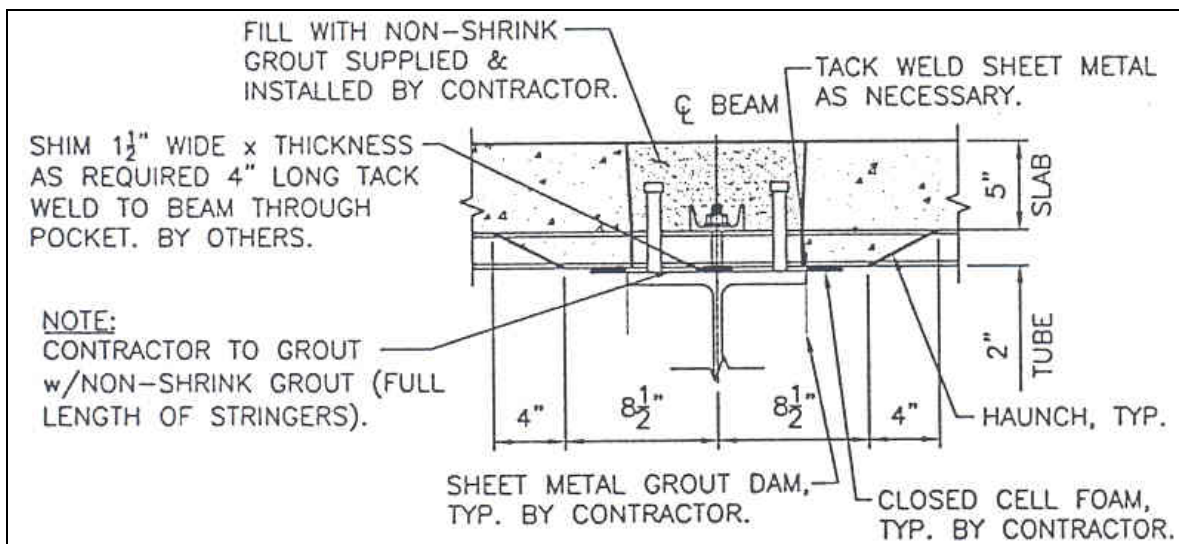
Typical shear pocket section for bridge over Little River Town, Stowe, VT (The Fort Miller Co., Inc., 2000)
